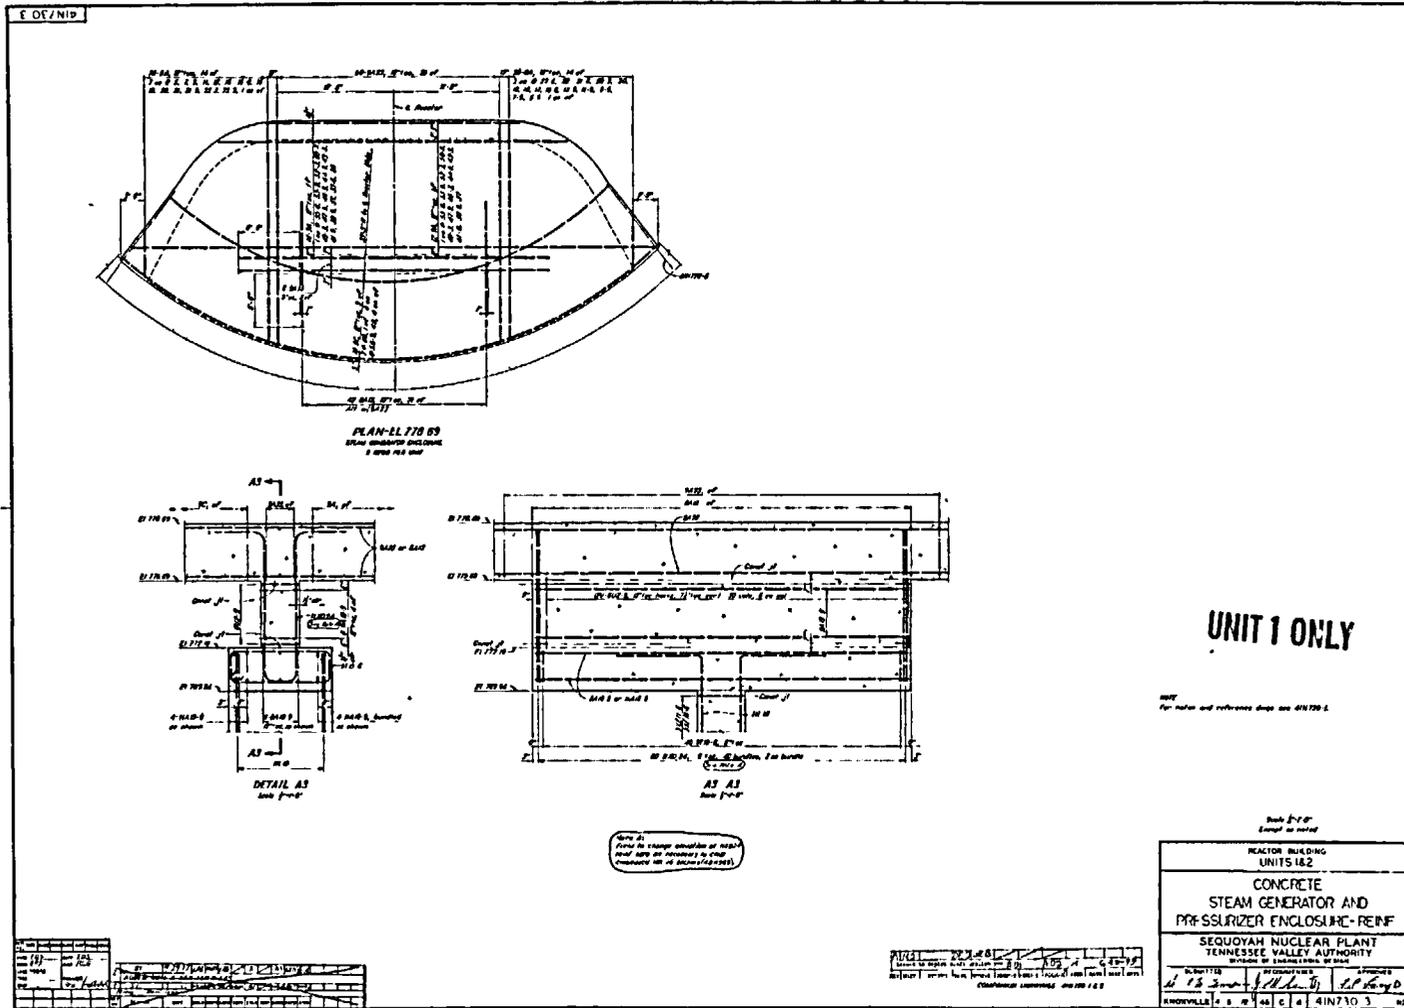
Concrete Steam Generator and Pressurizer Compartment - Reinforcement
